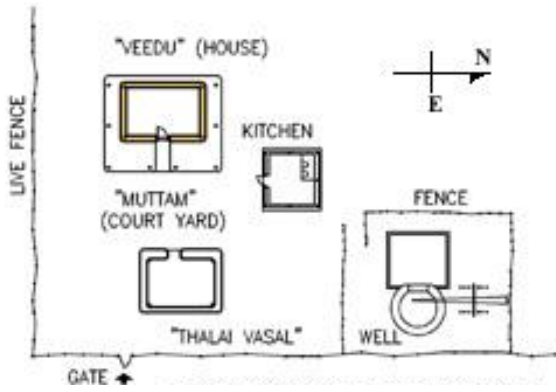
Layout showing the main elements of Jaffna Village House (Source: Author)
